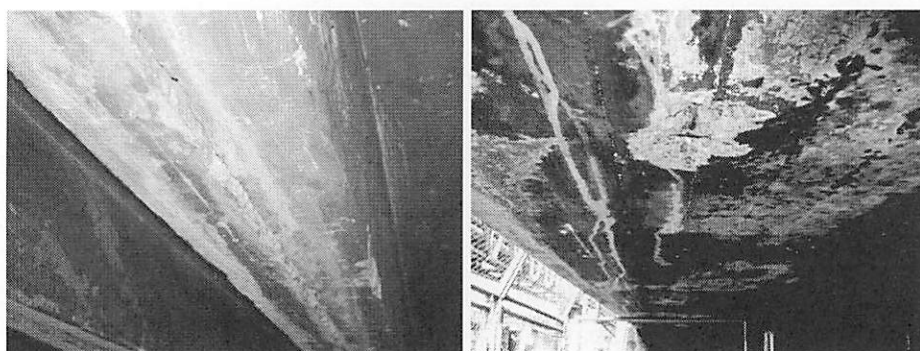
Corrosion of re-bar and spalling of concrete
